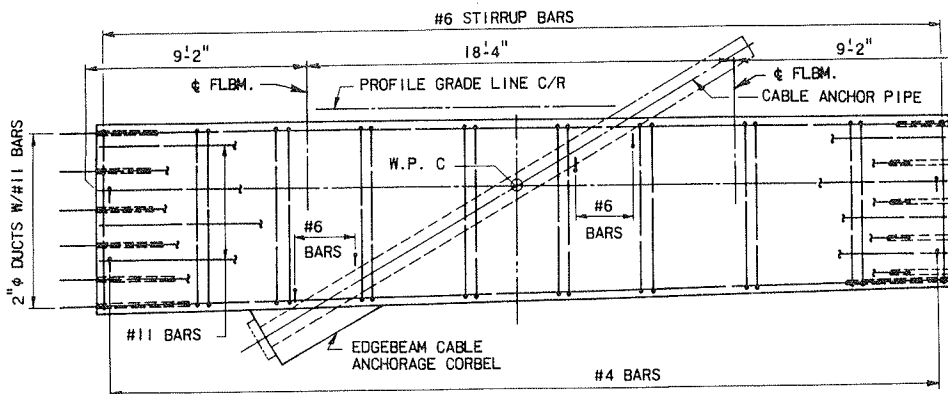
Concrete alternative: edge beam reinforcing details.
